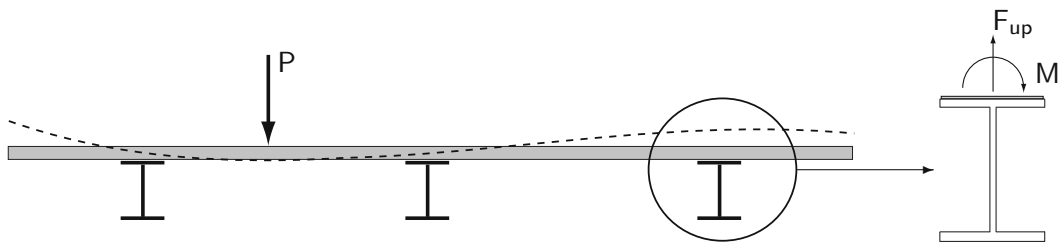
Uplift force and bending moment in adhesive layer caused by load on bridge deck
